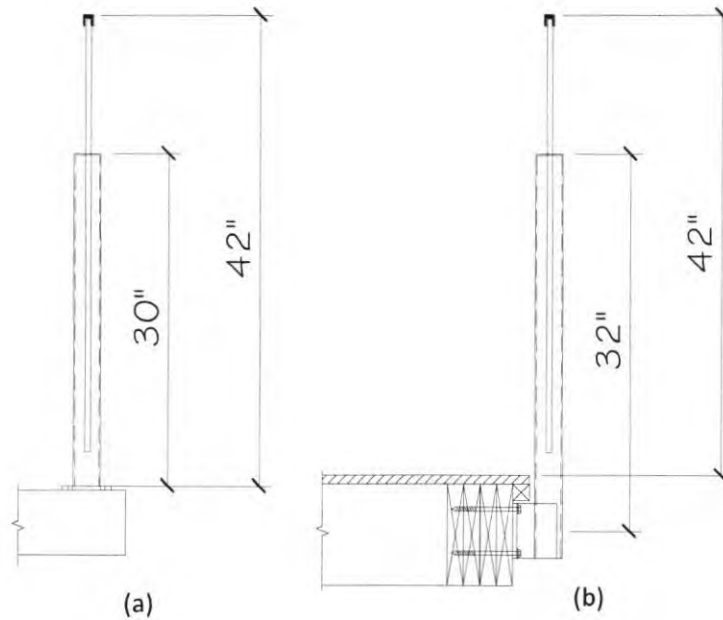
(a) Top-mount guardrail (b) Face-mount guardrail
